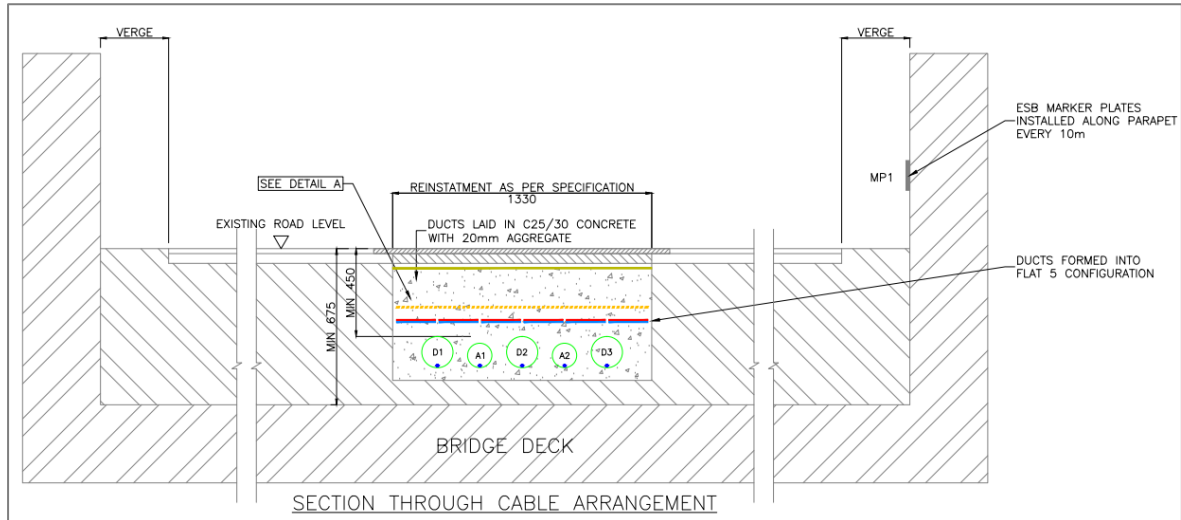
EirGrid standard bridge crossing detail, ducting laid within the carriageway
